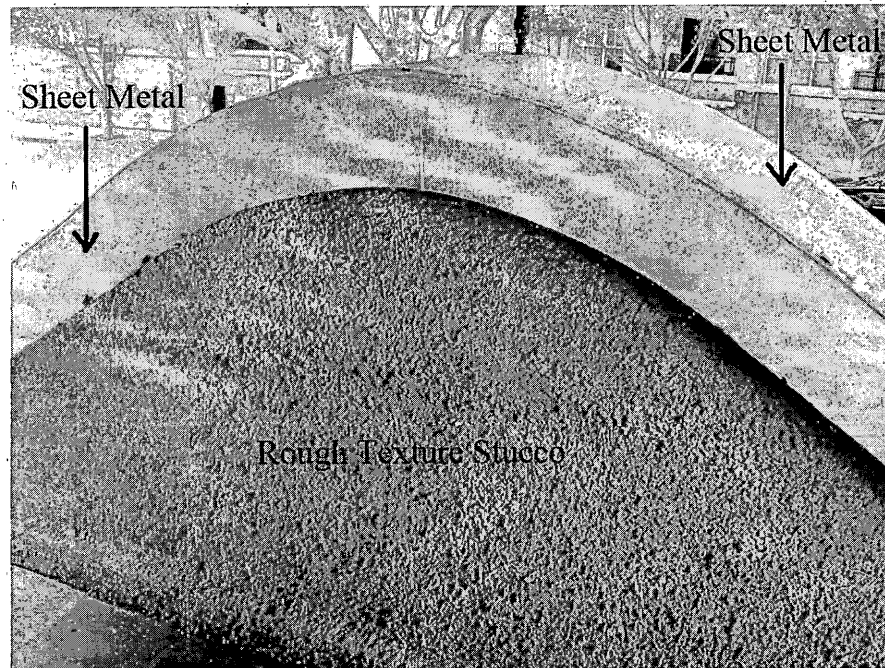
Looking west, within upper porch, at the sheet metal coping over parapet with a rough texture stucco wall surface.
